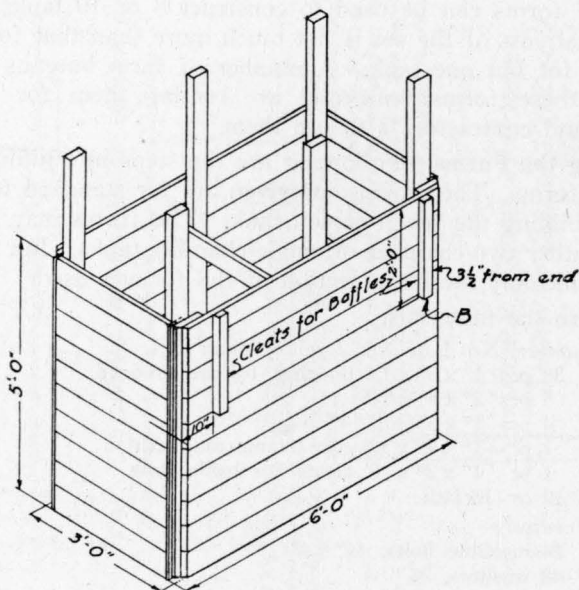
FORMS ASSEMBLED FOR BUILDING A SINGLE-CHAMBER SEPTIC TANK
